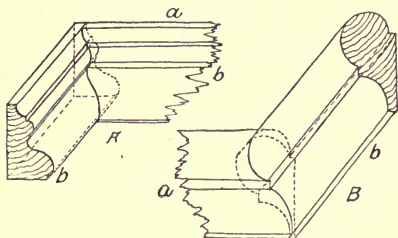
COPED JOINTS OF BASE AND PICTURE MOLDINGS.
